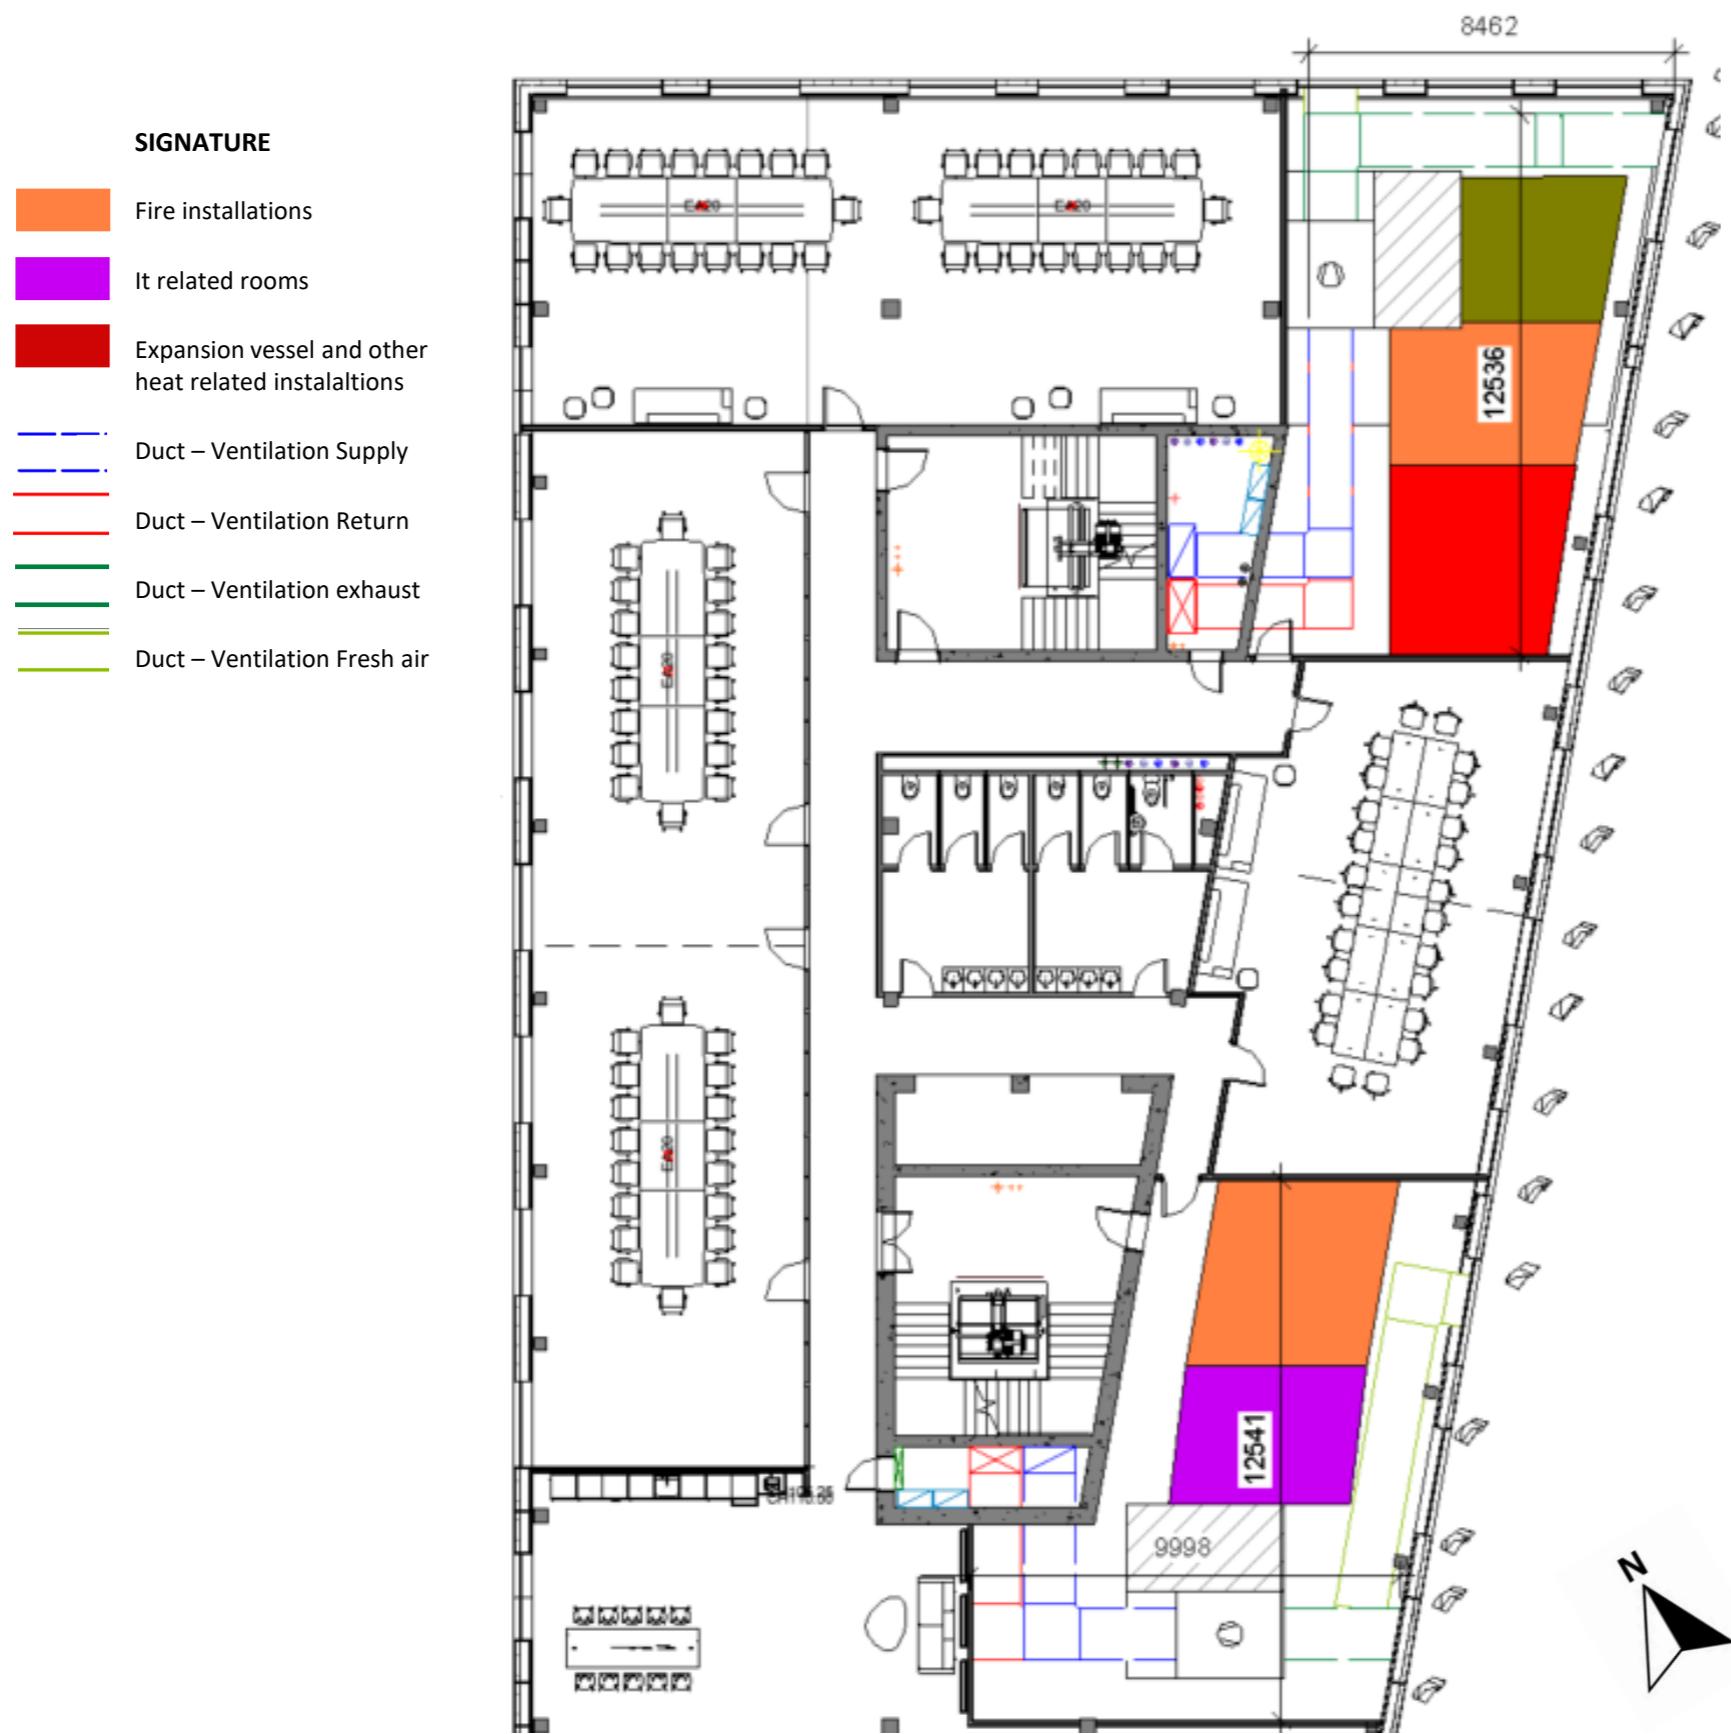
Plan of level 7 where the technical room is located'. Since the two shafts are placed in the northern and southern end of the building and the architects would like to avoid dead ends around the core, the technical rooms was split into to. Beside space for the ventilation units, the technical rooms have space for booster pumps for the fire installations, expansion vessels for the heating system and space for it related installations
